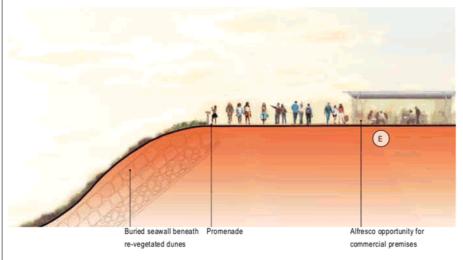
Typical Section showing High Crested Buried Revetment in Masterplan
